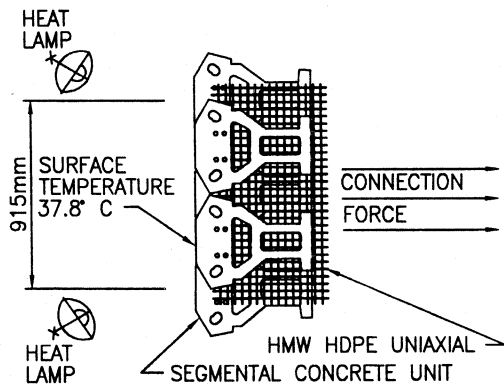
Laboratory Connection Strength, at Elevated Temperature, Test Apparatus
